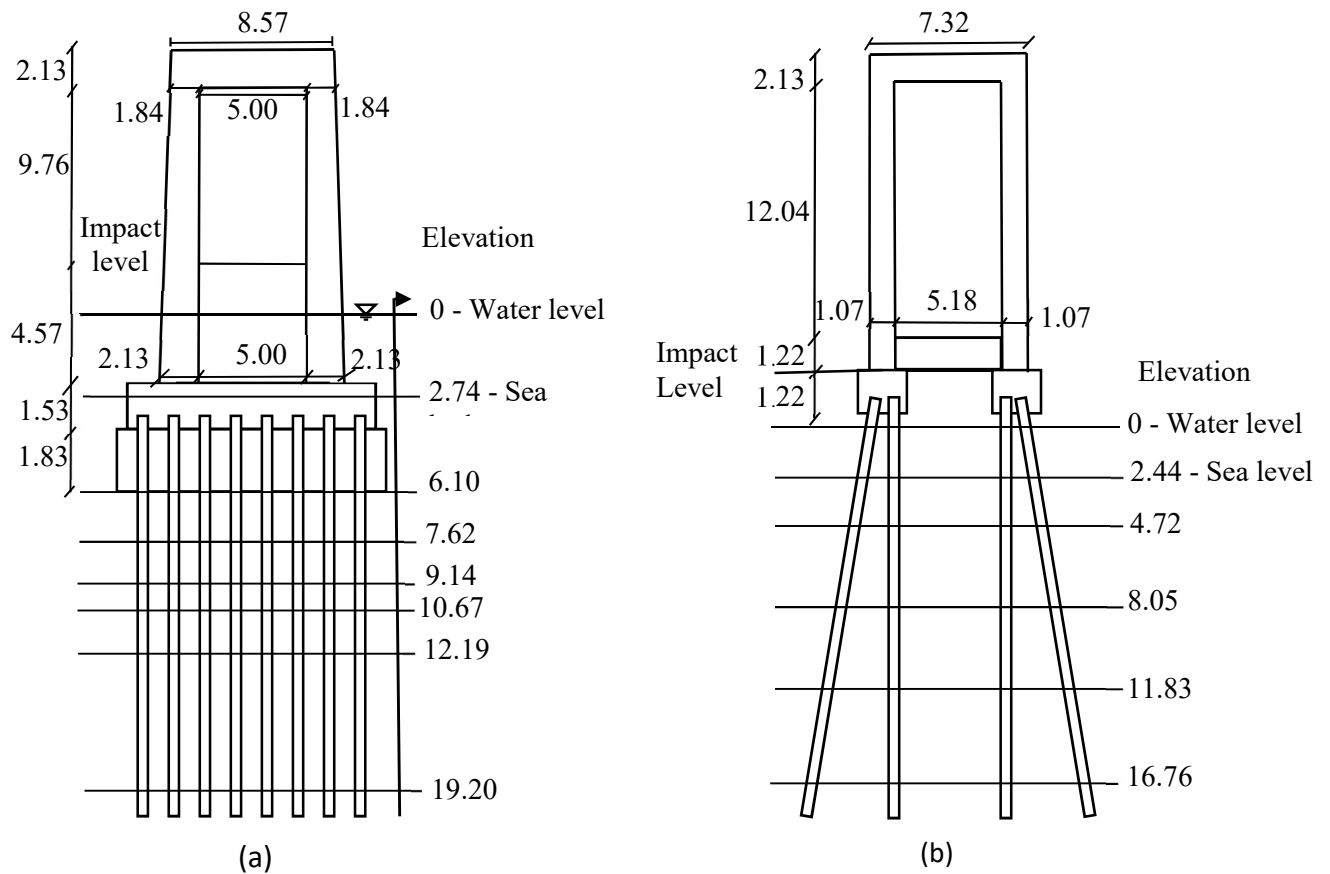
Section view of case study bridge pier; (a) Stiff pier, (b) Flexible pier (unit in meters) [3]
